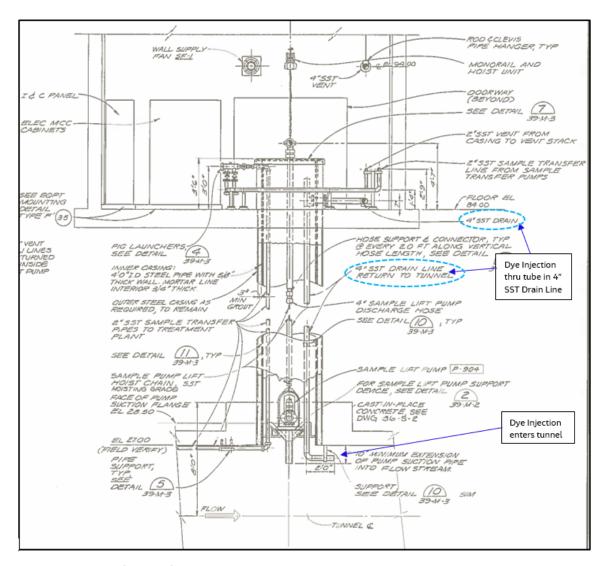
Drawing of the Outfall Tunnel Sample Pump Station and Planned Dye Injection into 4-inch Drain Line
